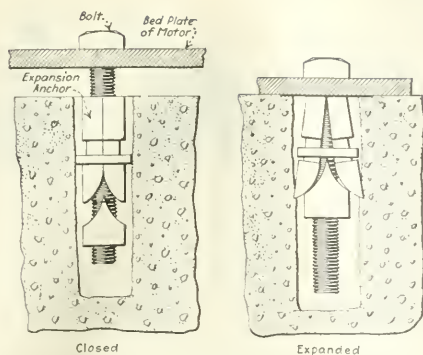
SINGLE-SPREAD ANCHOR BOLT IN POSITION
